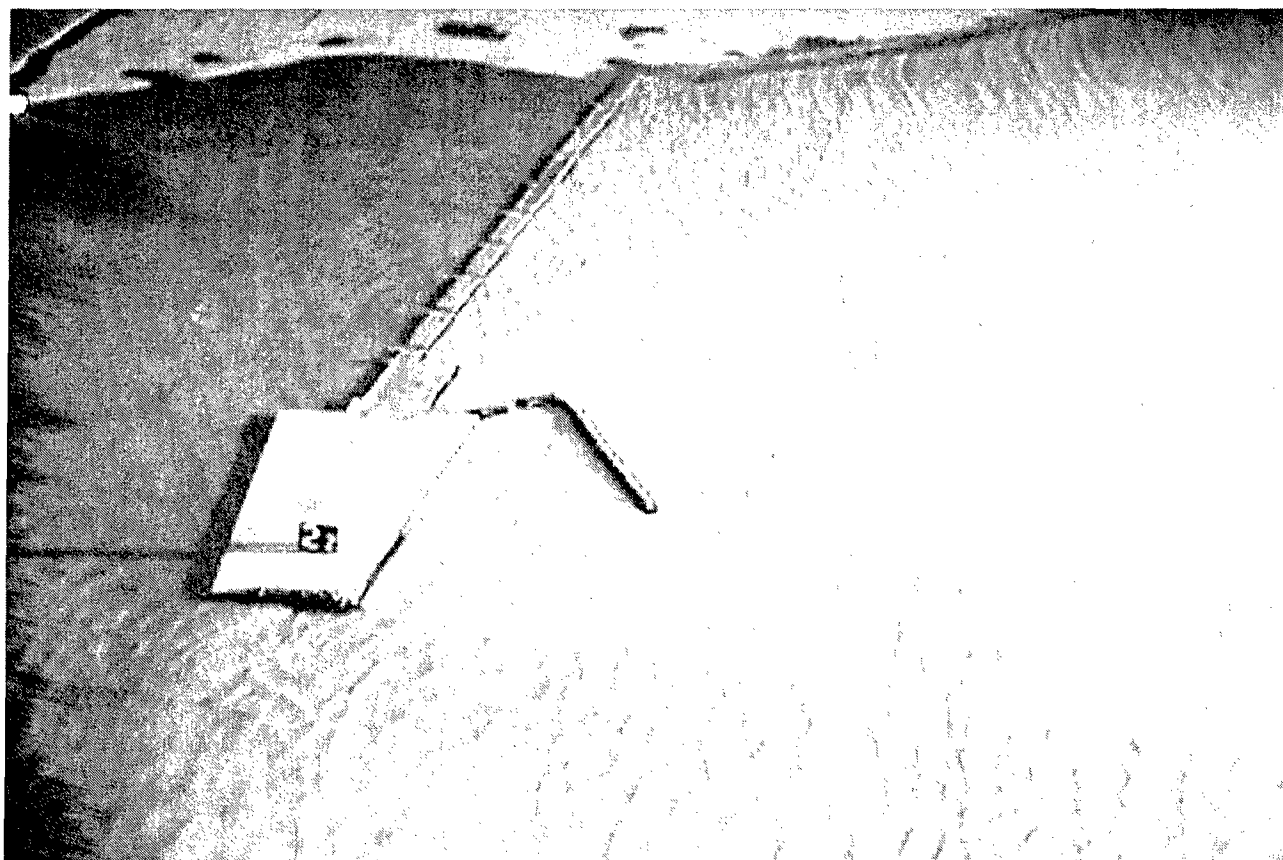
Typical wave patterns for Plan 3; 4.7-sec, 1.2-m (4-ft) waves from 90 deg
